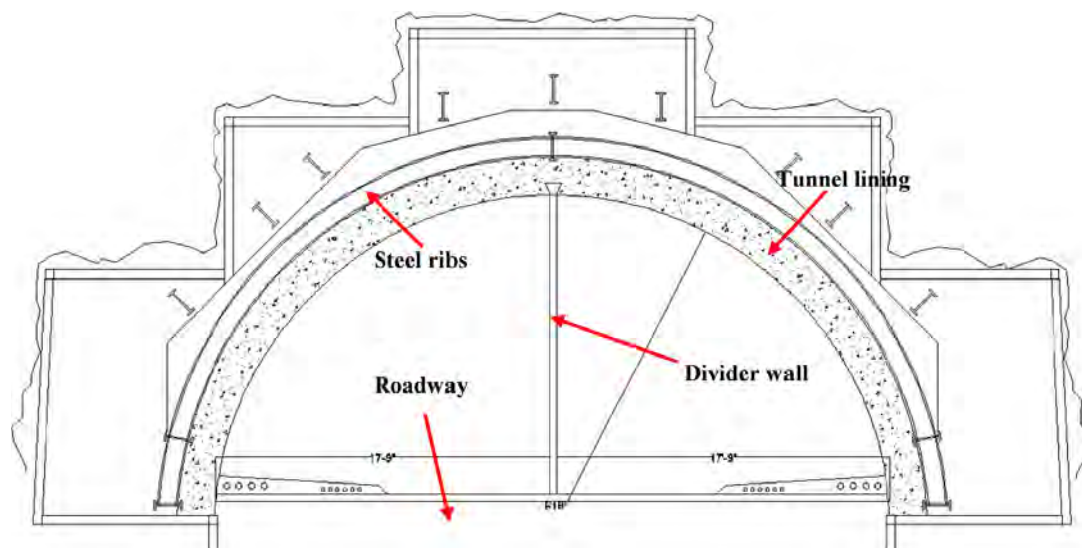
Eisenhower Memorial Tunnel plenum view indicating interior precast divider wall, structural steel ribs, roadway, and concrete tunnel lining.
